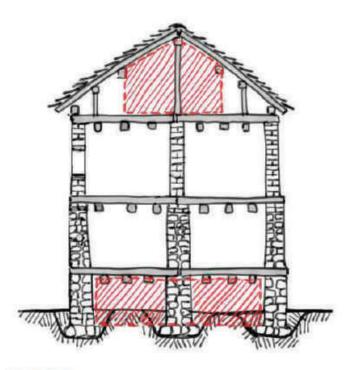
A possible reuse of the volumes of the attic and the basement of a traditional building
